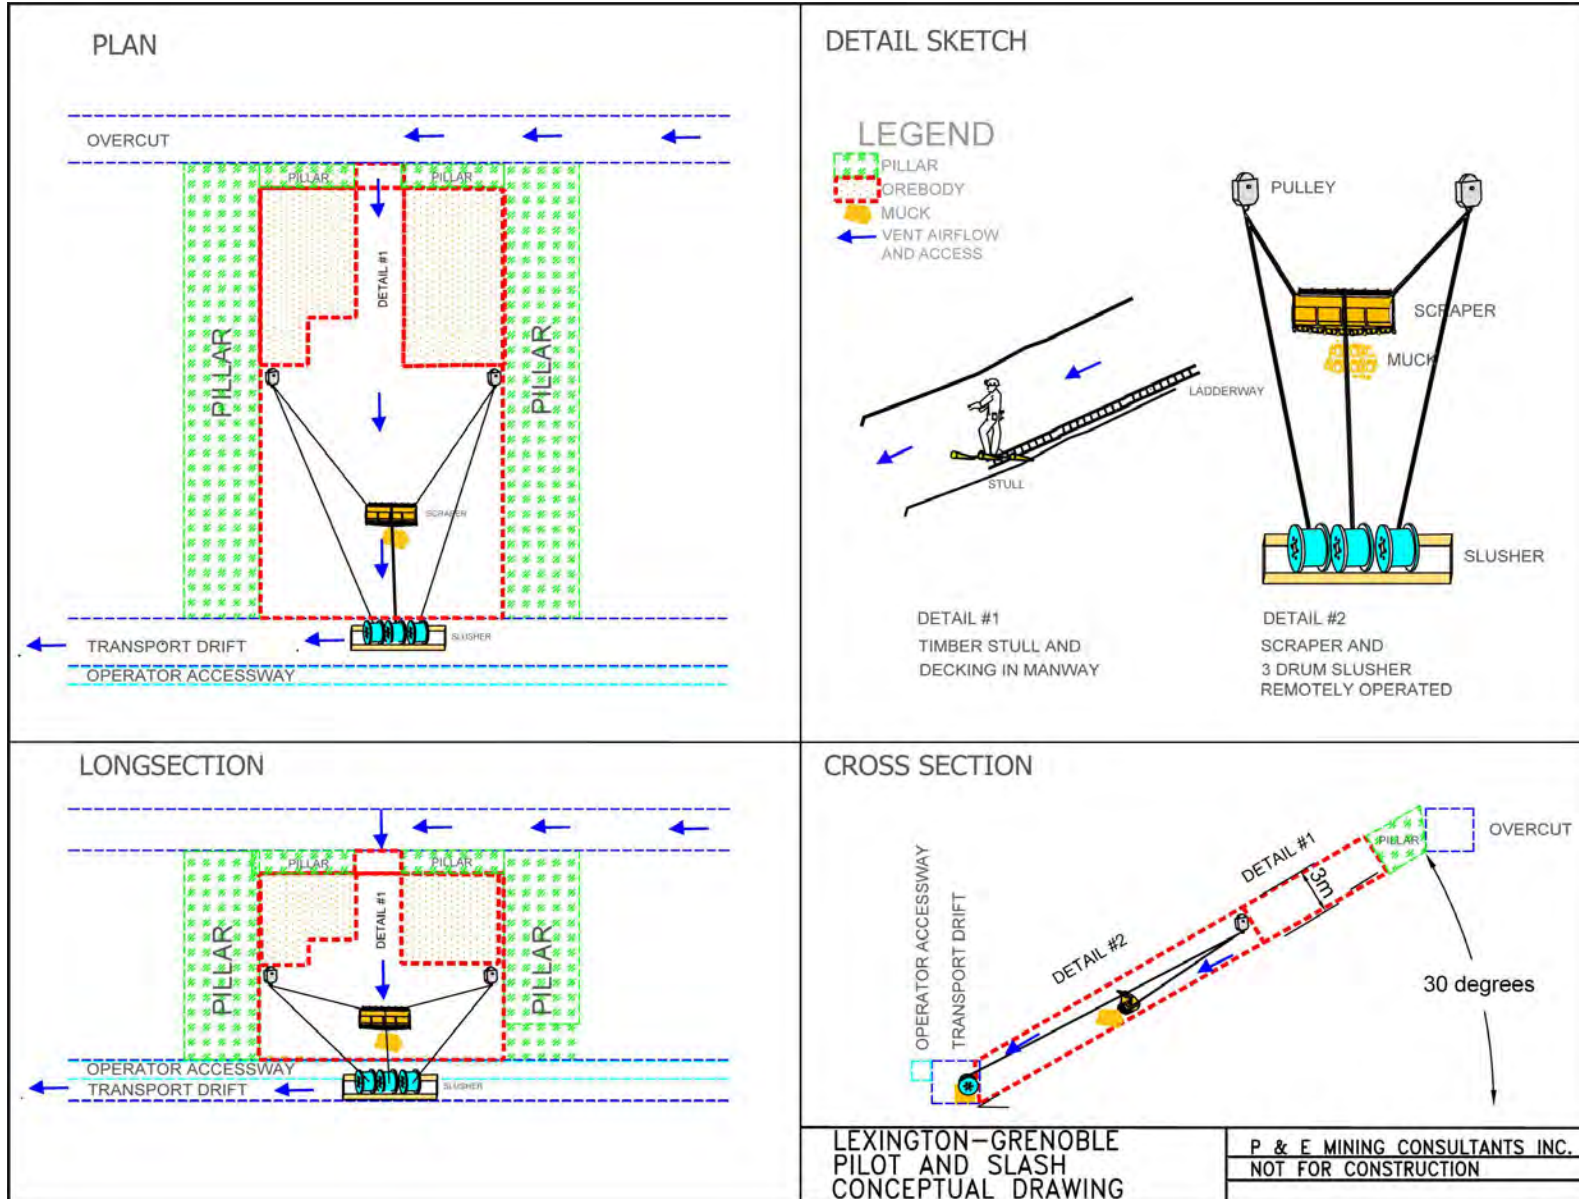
Typical Lexington-Grenoble Raise and Slash Stope
